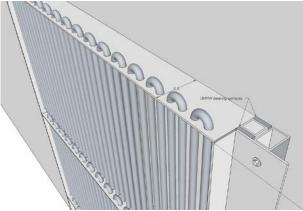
Detail of proposed fish refuge panel with hanging chains.
